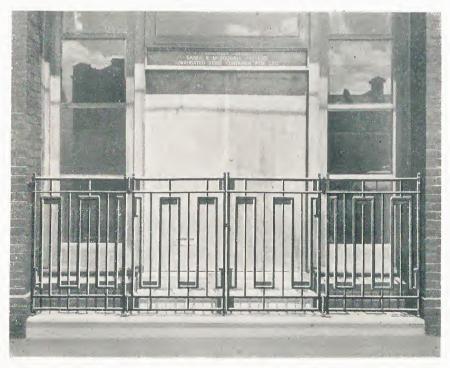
Adding distinction to the entrance of a modern office building. Made and erected by us to architect's design.
